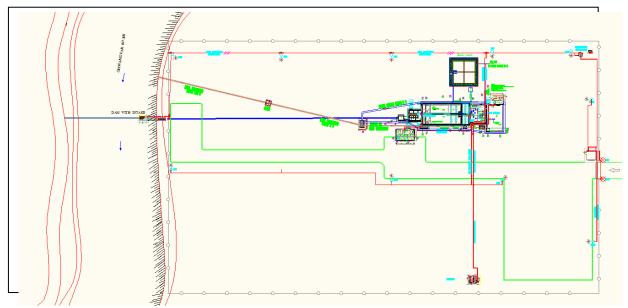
Location Plan of Proposed Sethamouak Water Treatment Plan
